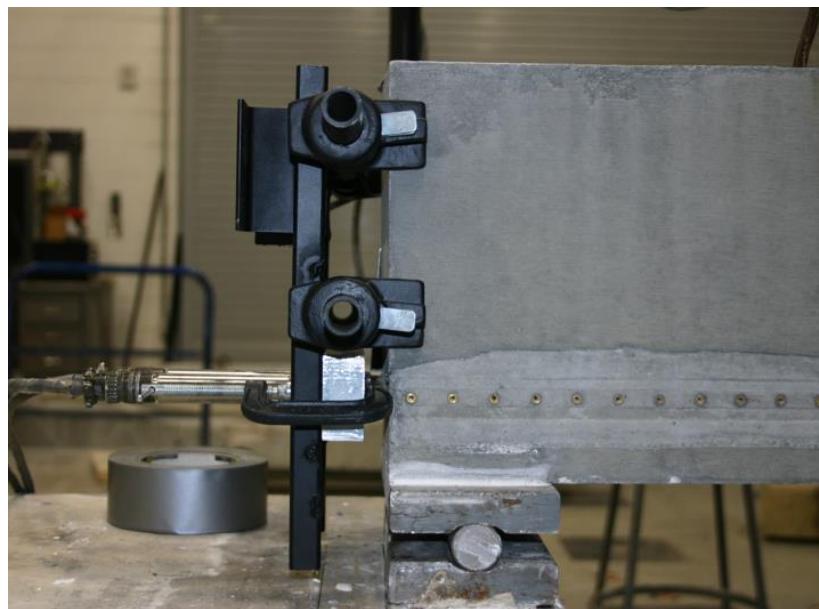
Side View of the End-Slip LVDT Assembly.
